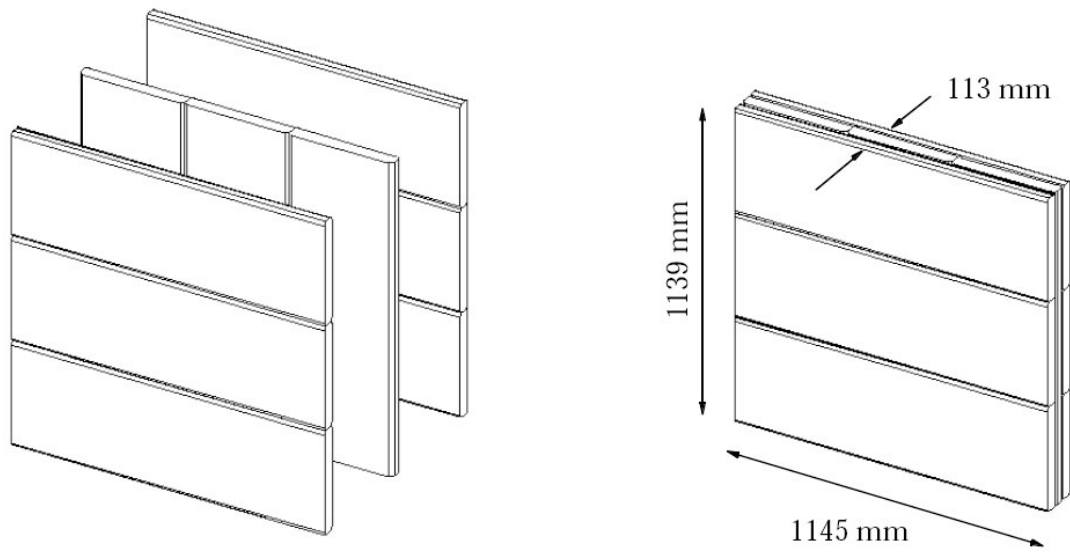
c: A triple layer built-up lumber specimen consisting of nine studs.
